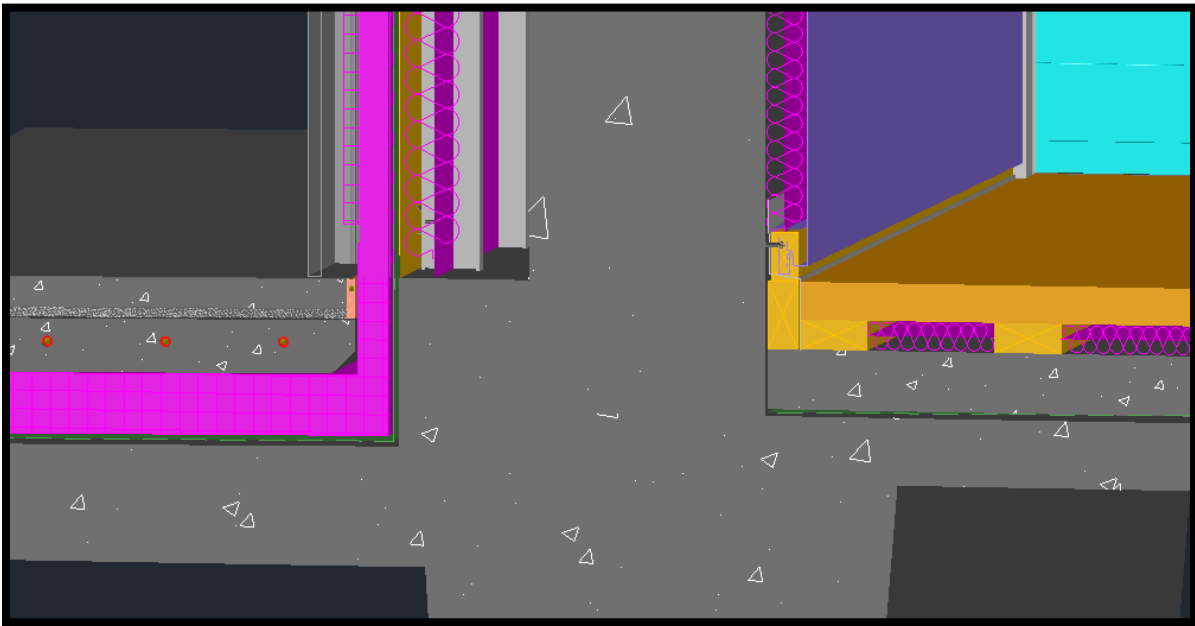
A close up image of the virtual mockup showing the exterior side of the building (on the left side) and the interior finishes (on the right side) of the building.
